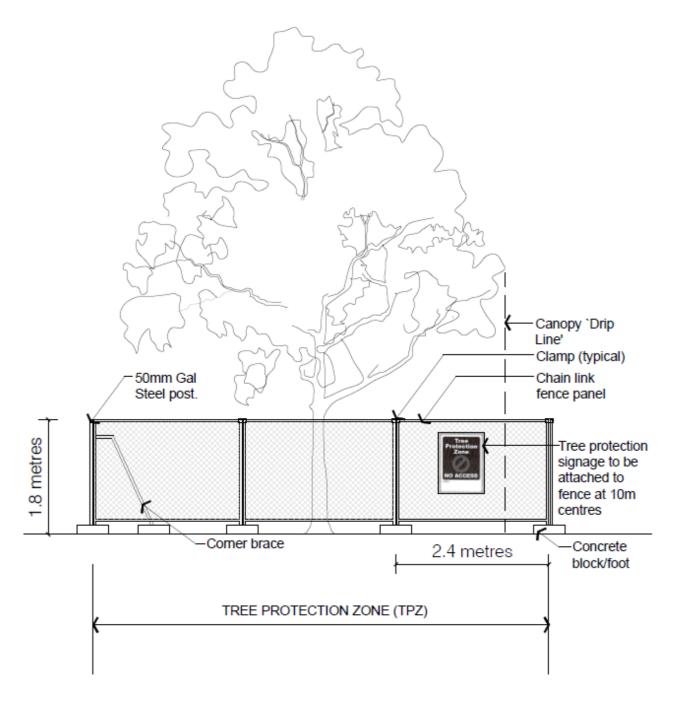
Tree Protection Fence detail. Source – AS 4970-2009 Protection of trees on development sites, p16
